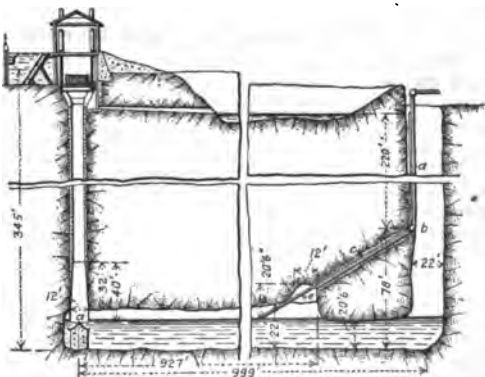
Taylor Hydraulic Compressor Installation near Cobalt, Ont.
